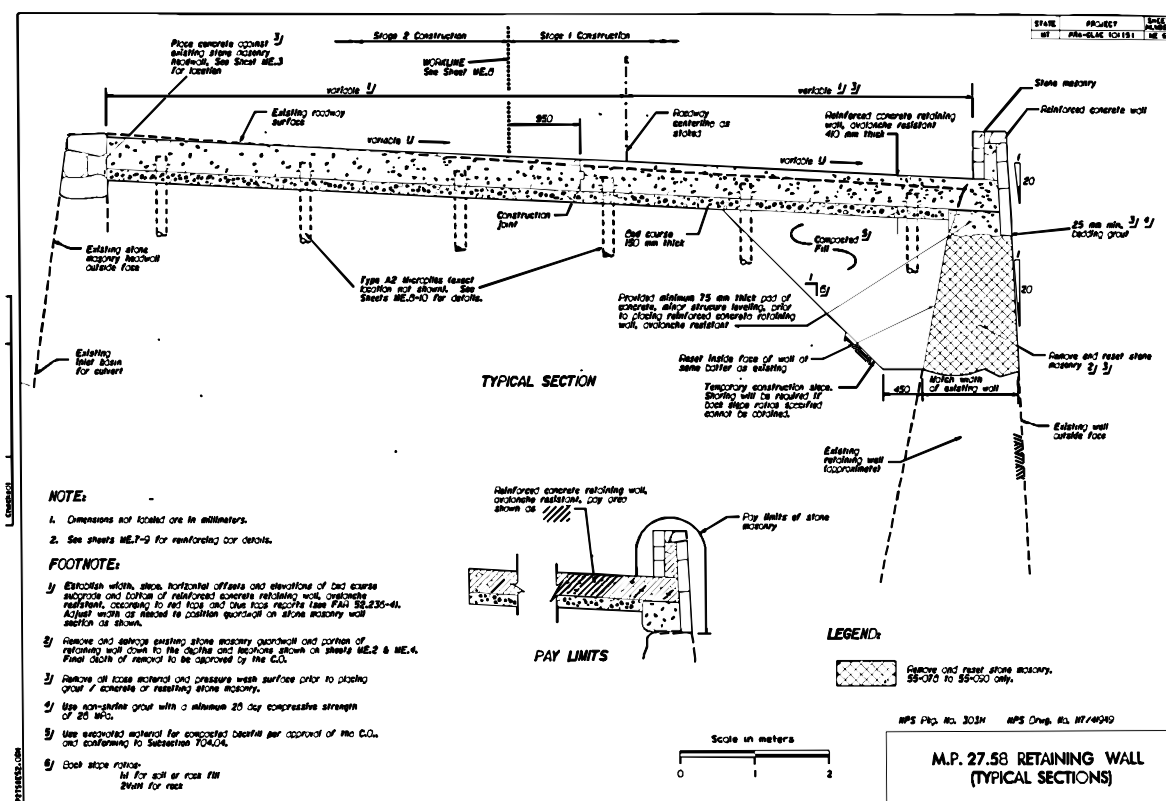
The FHWA design for retaining wall repair uses a concrete slab anchored with micropiles
